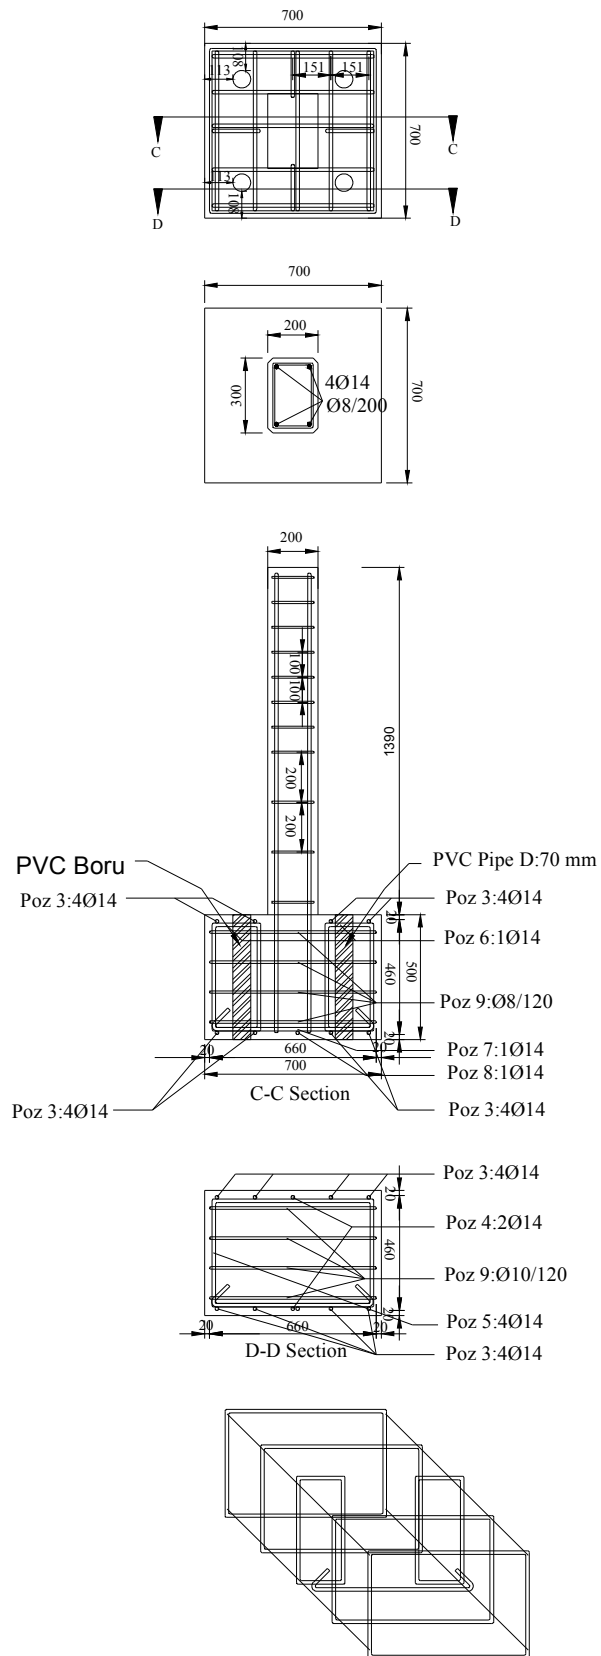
Reinforcing cage of the first type specimens (east side).
